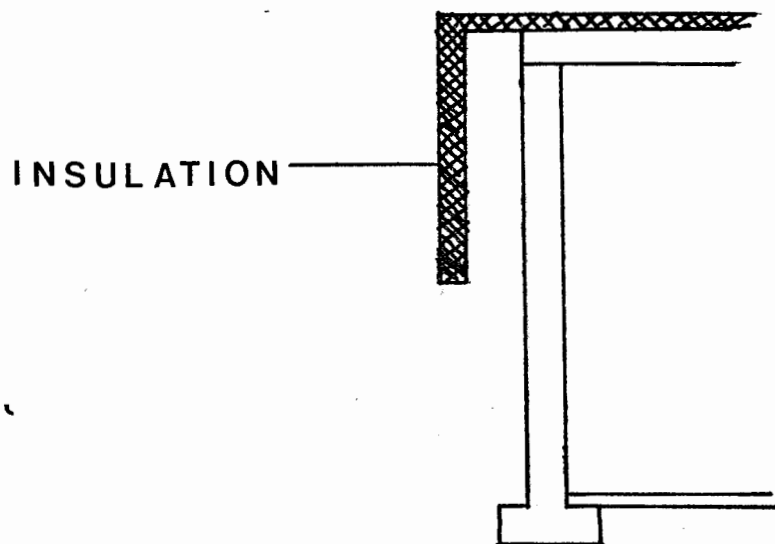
Wall Insulation (Wall Three) (Underground Space Center, 1978, p. 65).
